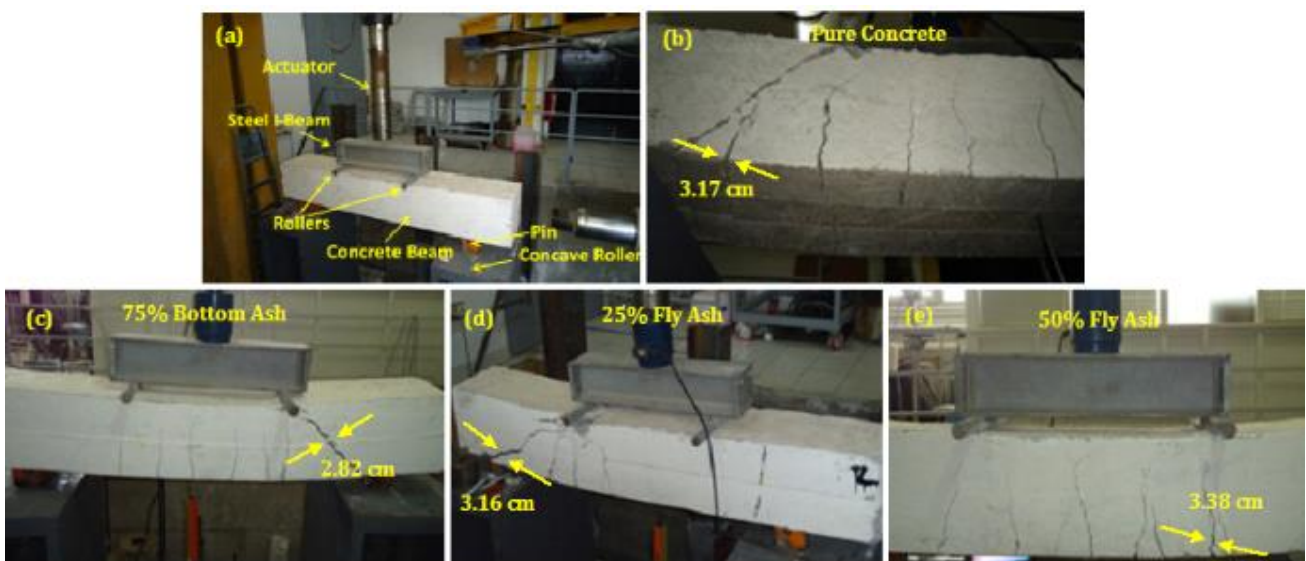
Crack and flexure behavior of reference concrete beam: (a) Static testing apparatus; (b) Pure concrete; (c) 75% Bottom ash; (d) 25% Fly ash; (e) 50% Fly ash (Karalar 2020).
